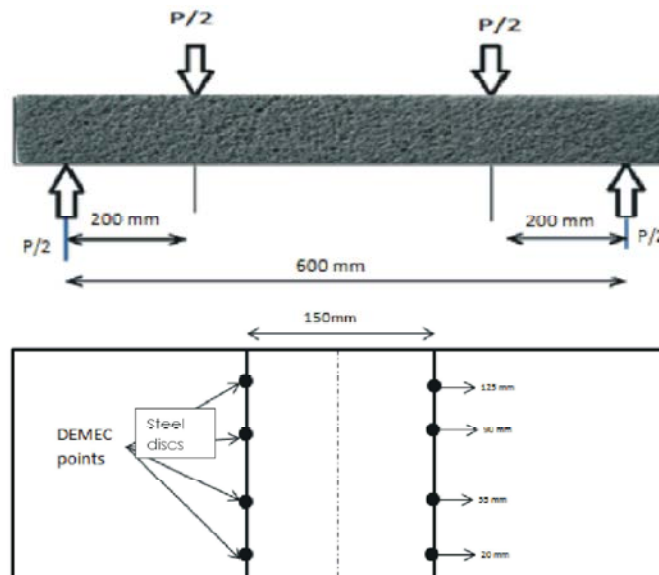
Loading pattern and locations of steel discs on the surface of the beam
